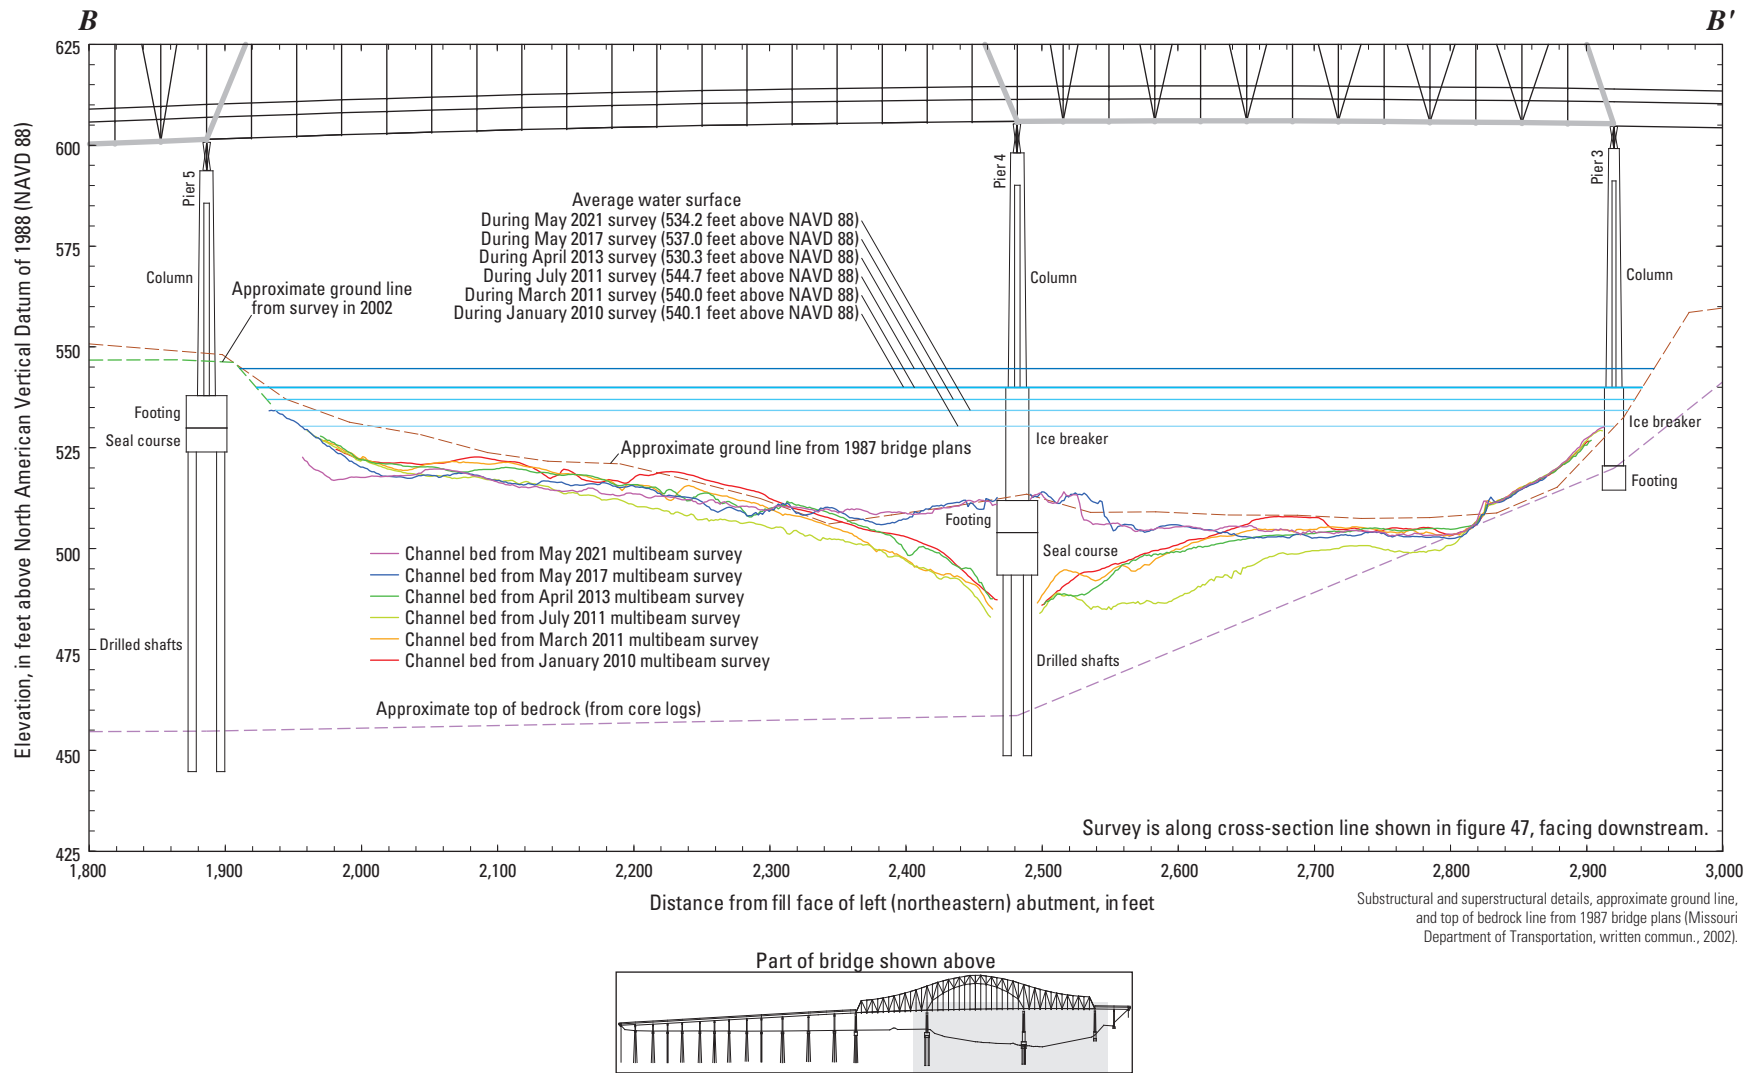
Key features, substructural and superstructural details, and surveyed channel bed of downstream structure A4497 on U.S. Highway 54 crossing the Missouri River at Jefferson City, Missouri.
